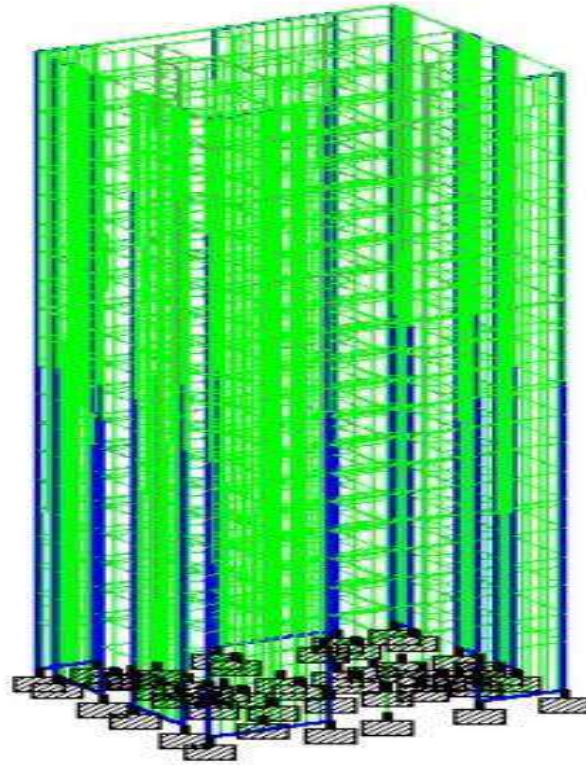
Displacement in G+20 Multi storied building with shear wall
